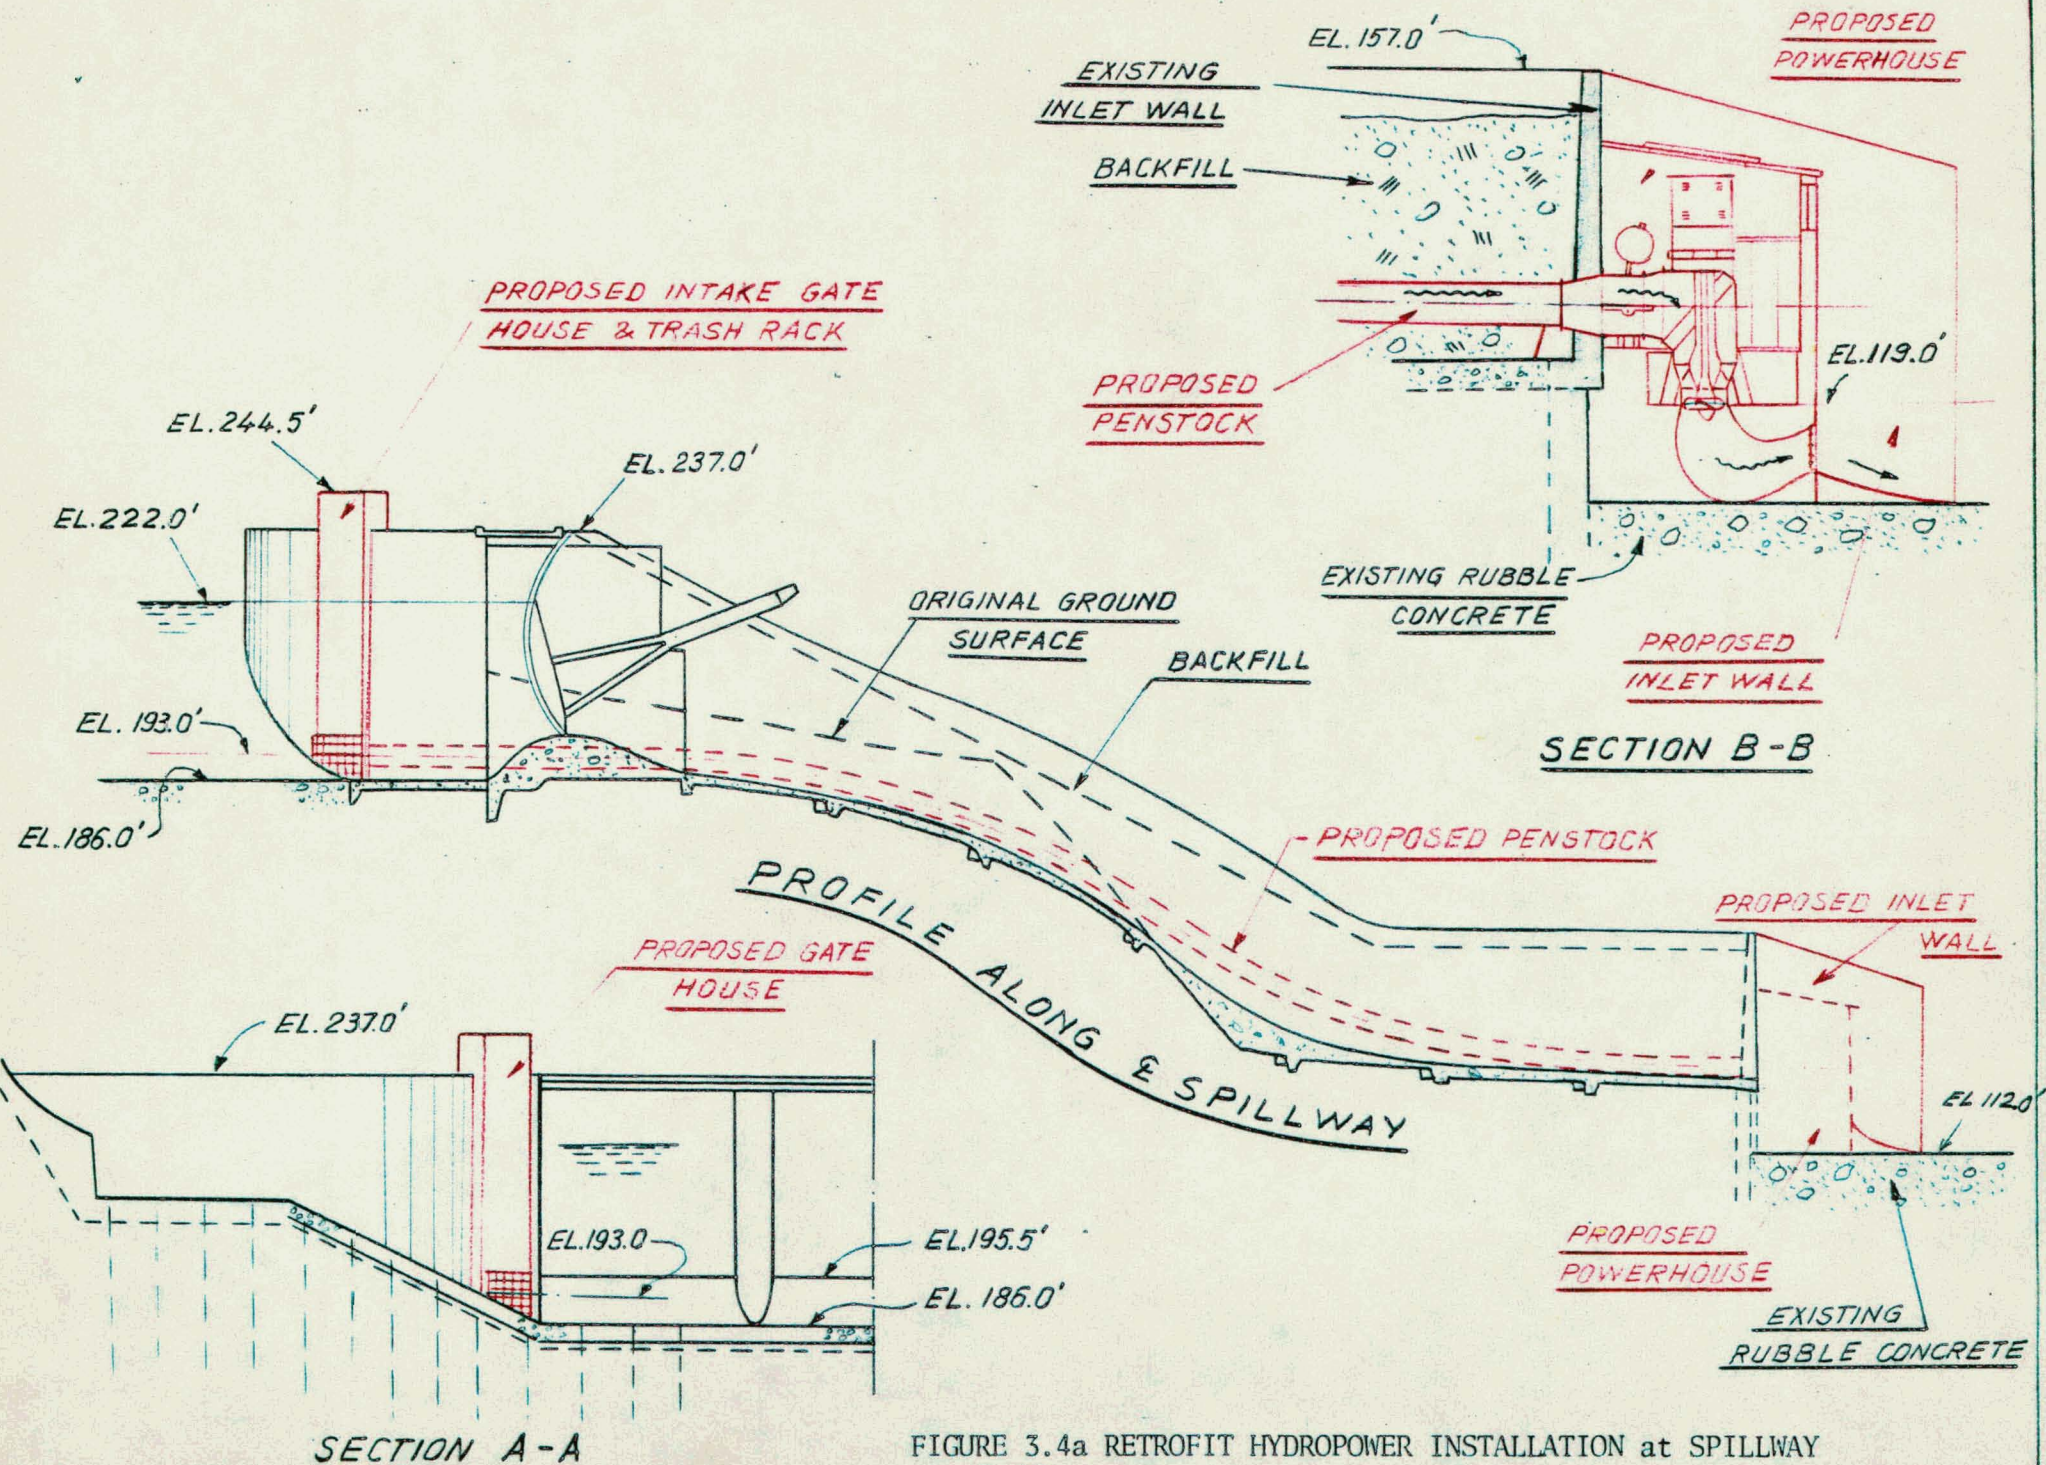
RETROFIT HYDROPOWER INSTALLATION at SPILLWAY
